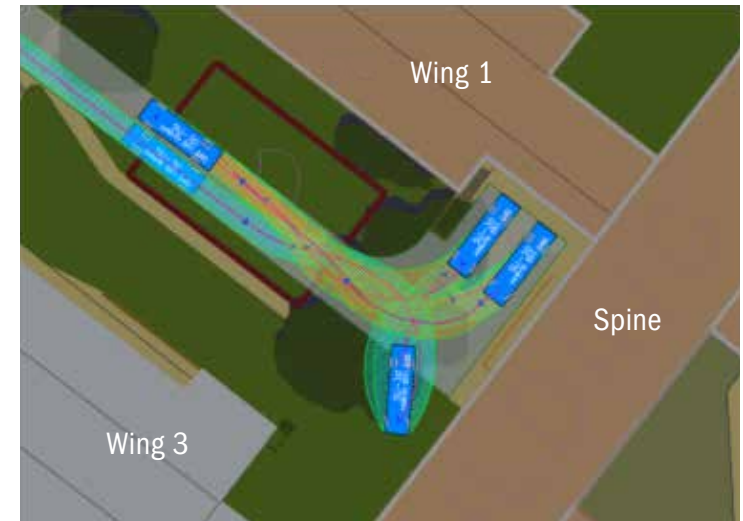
New Research Building Loading Dock Truck Maneuvers
